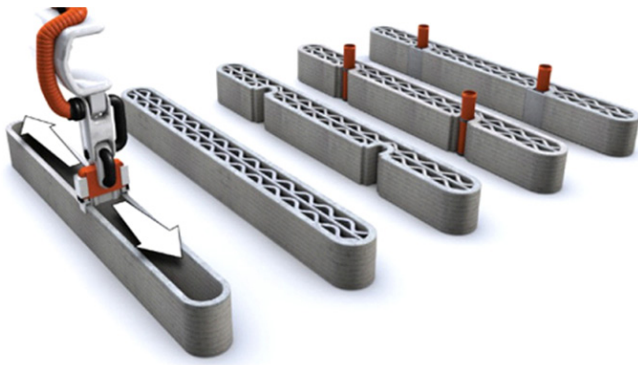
Schematic of a horizontal wall section by Contour Crafting [17]
